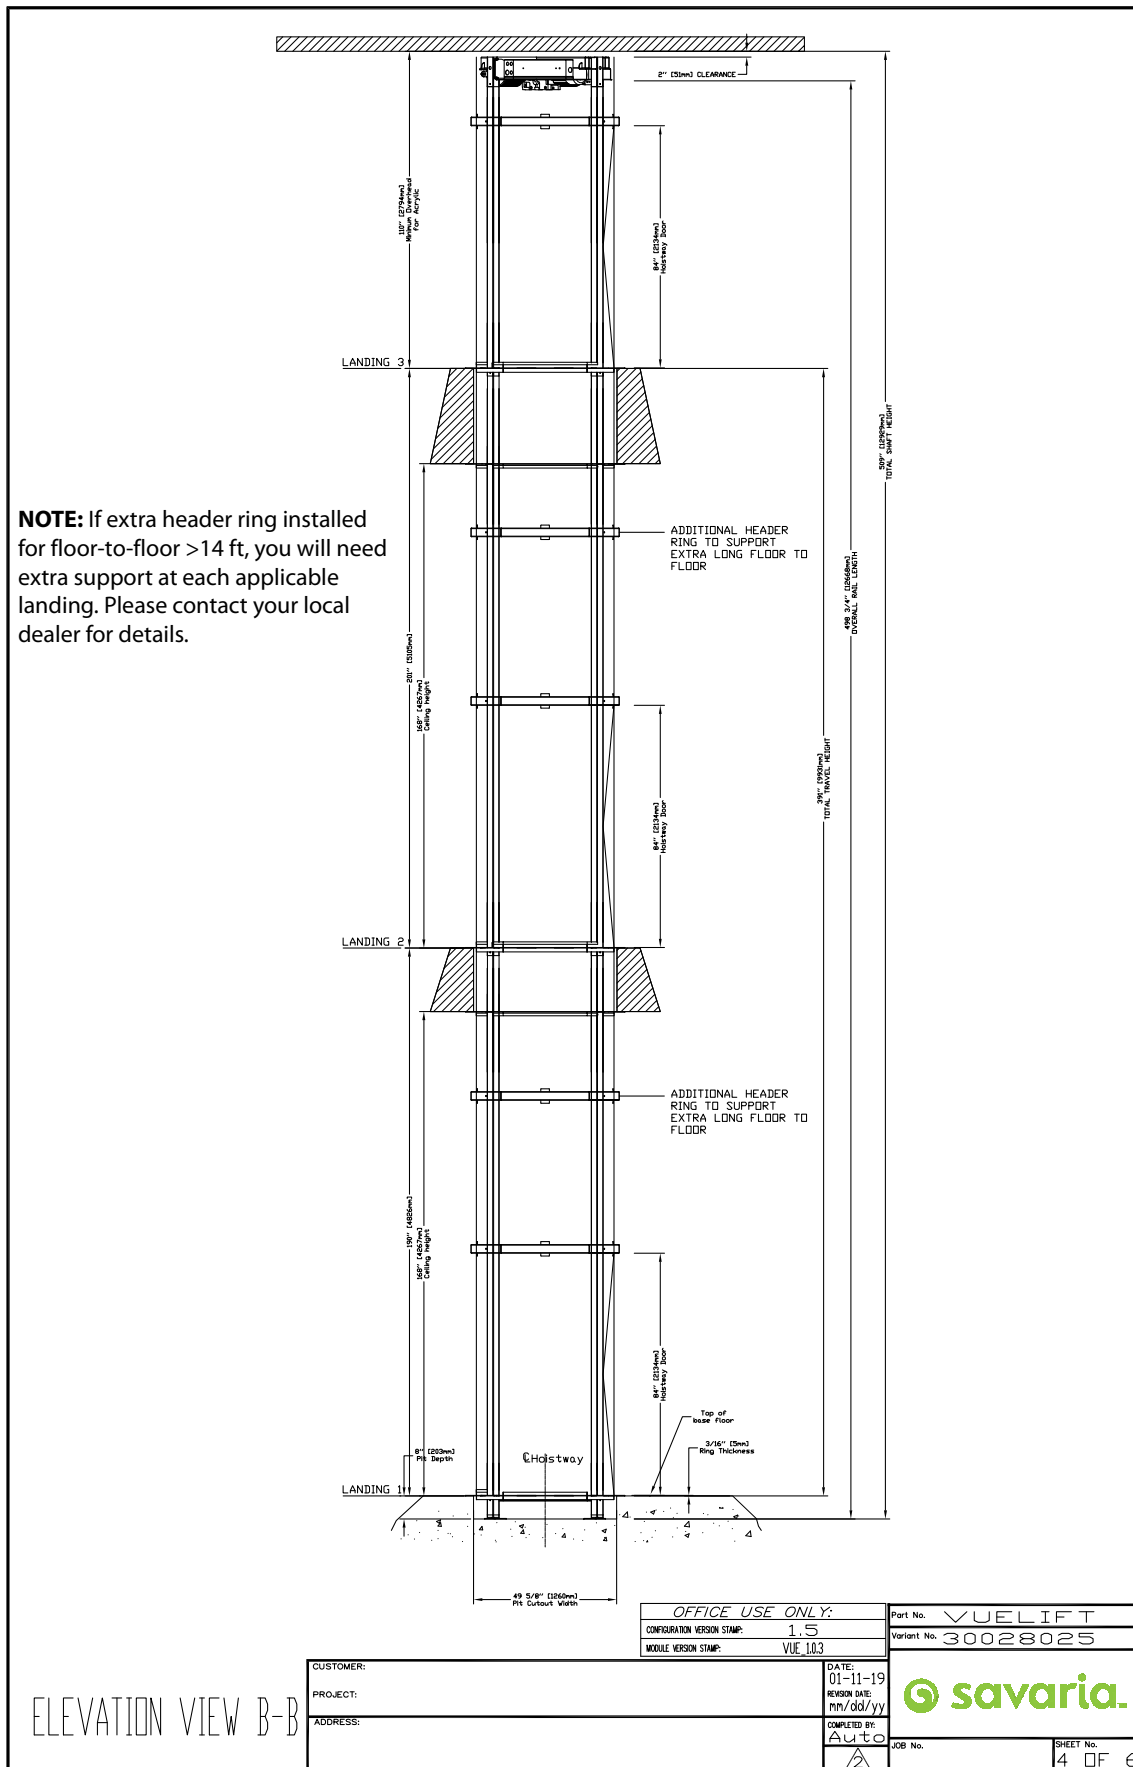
Elevation view (OGL, type 1) - extra header rings if floor-to-floor height &gt; 14 ft
